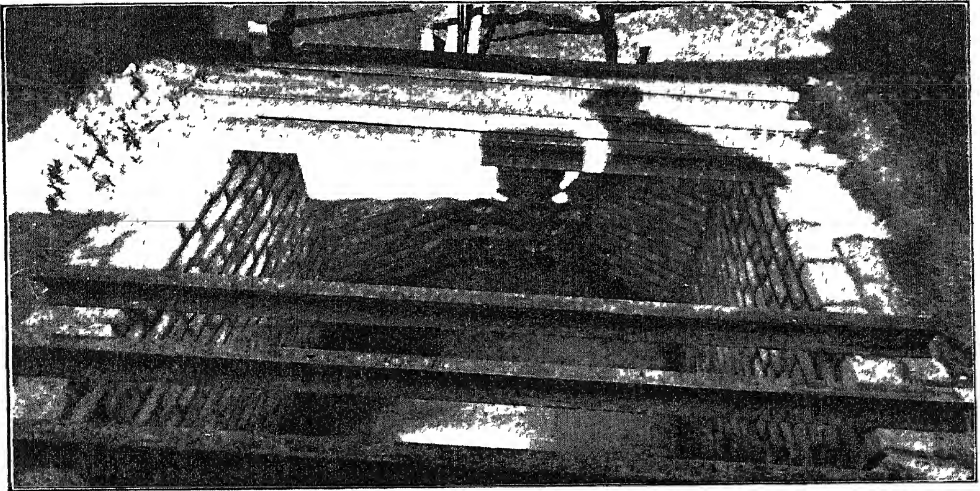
Steel for roof—first course of steel rails in place for supporting brick roof
